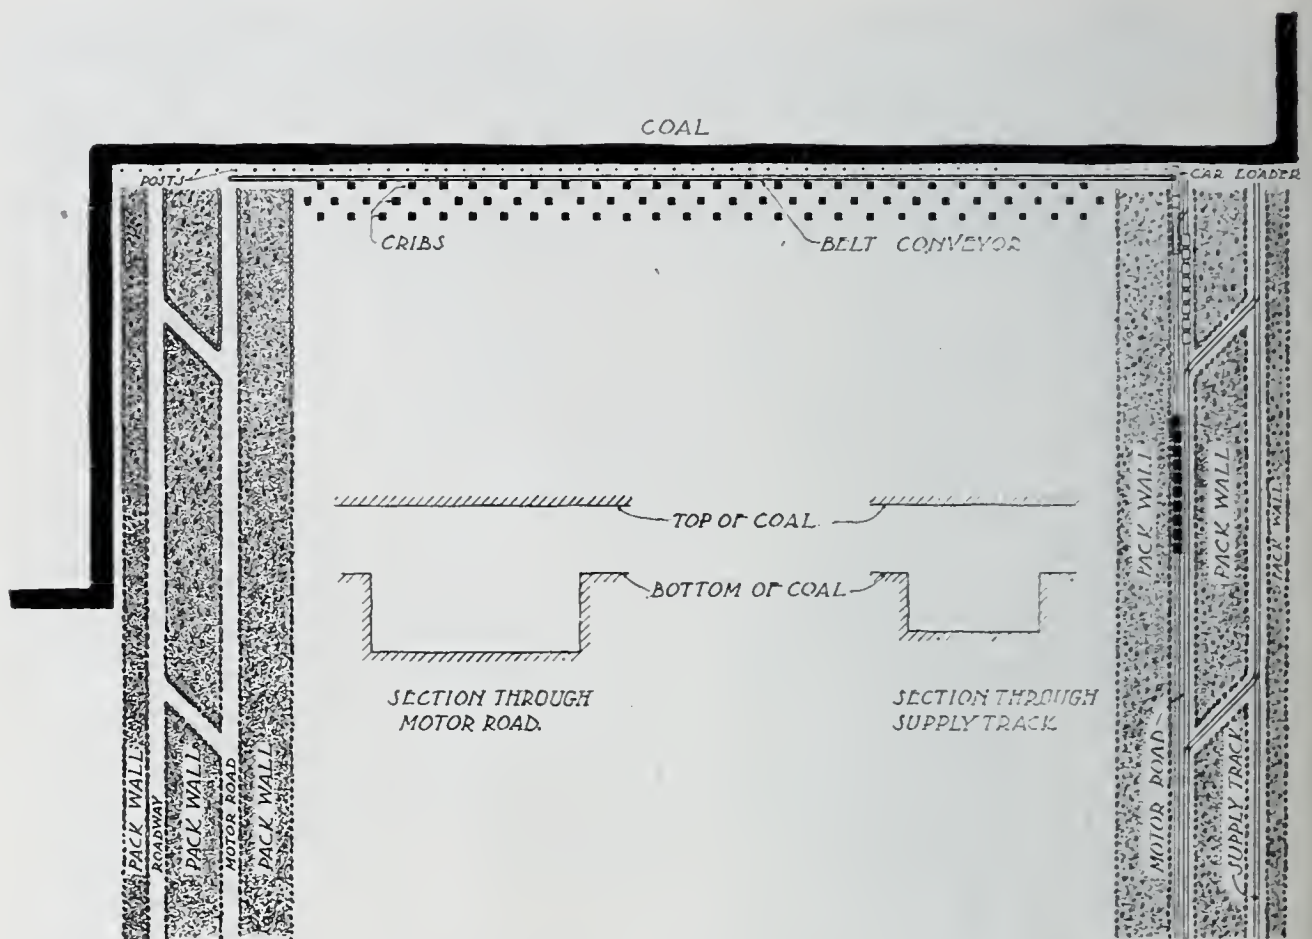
Long-Wall Machine Section with Belt Conveyor.
